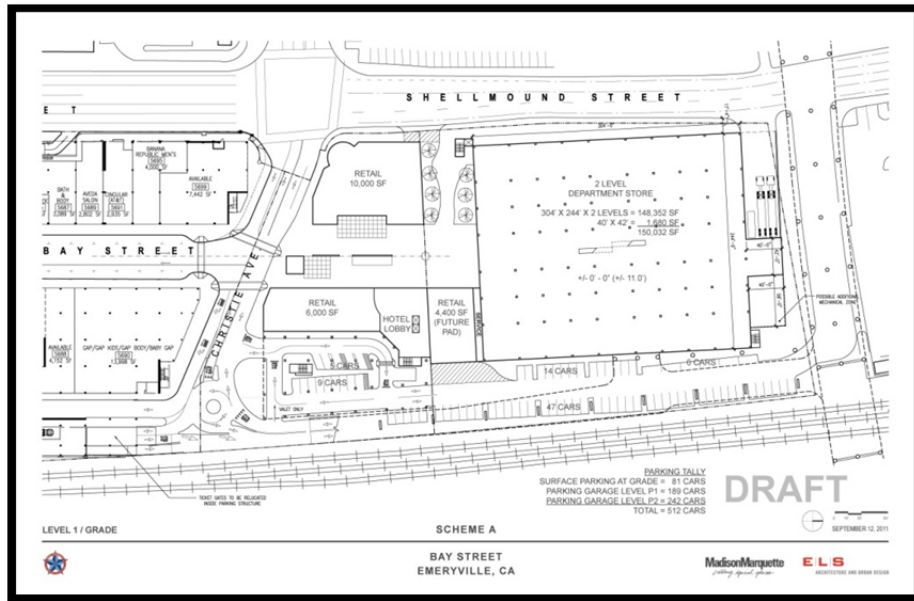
Madison Bay Street Macy's Site Plan - Ground Floor
